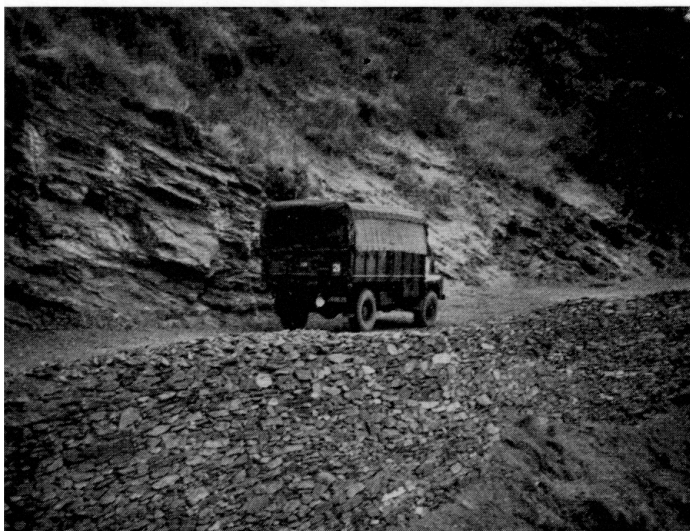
A RASC 3-tonner passing over a "dry wall" section (Chesoi-Tot track).
